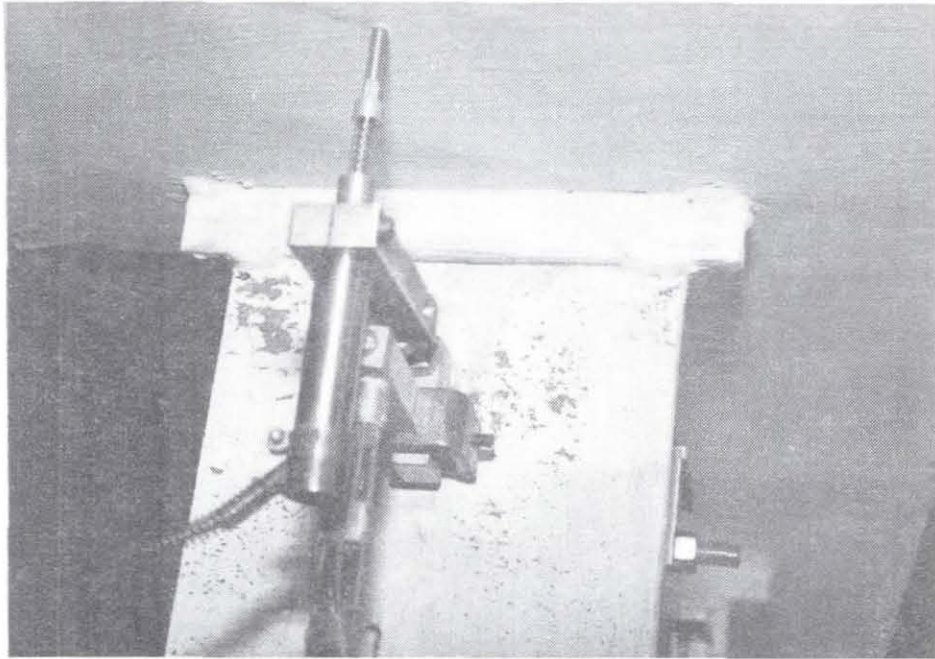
Flaking of Whitewash Started in the Area Where Welds Occurred (Specimen 18)
